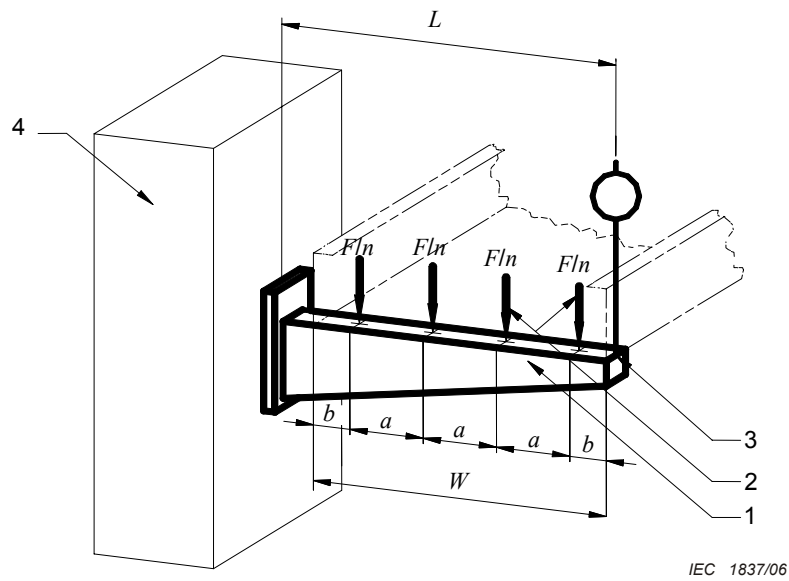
Test set-up for pendant fixed cantilever bracket designed for supporting cable tray systems or cable ladder systems
